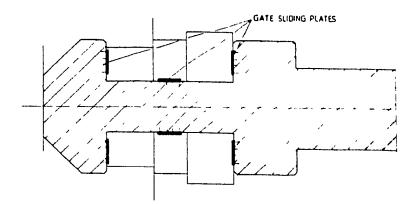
CROSS-SECTION OF PIER SHAFT AND GATE RECESSES
